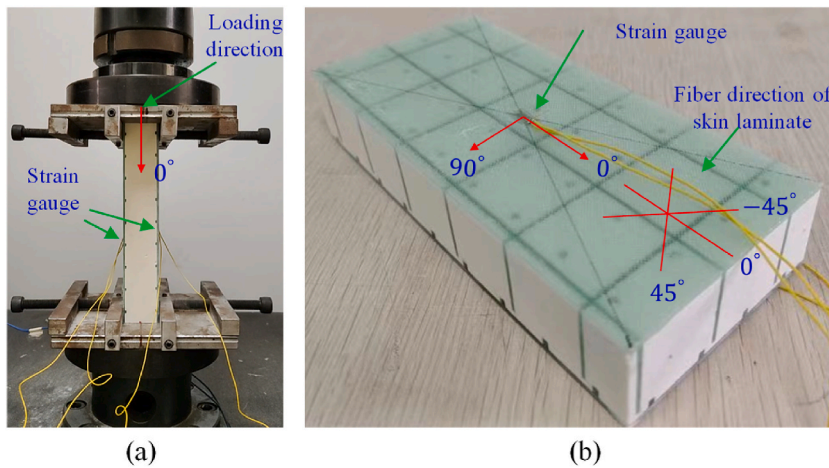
Test specimen and apparatus: (a) specimen fixed on the test machine and (b) locations of strain gauges.
